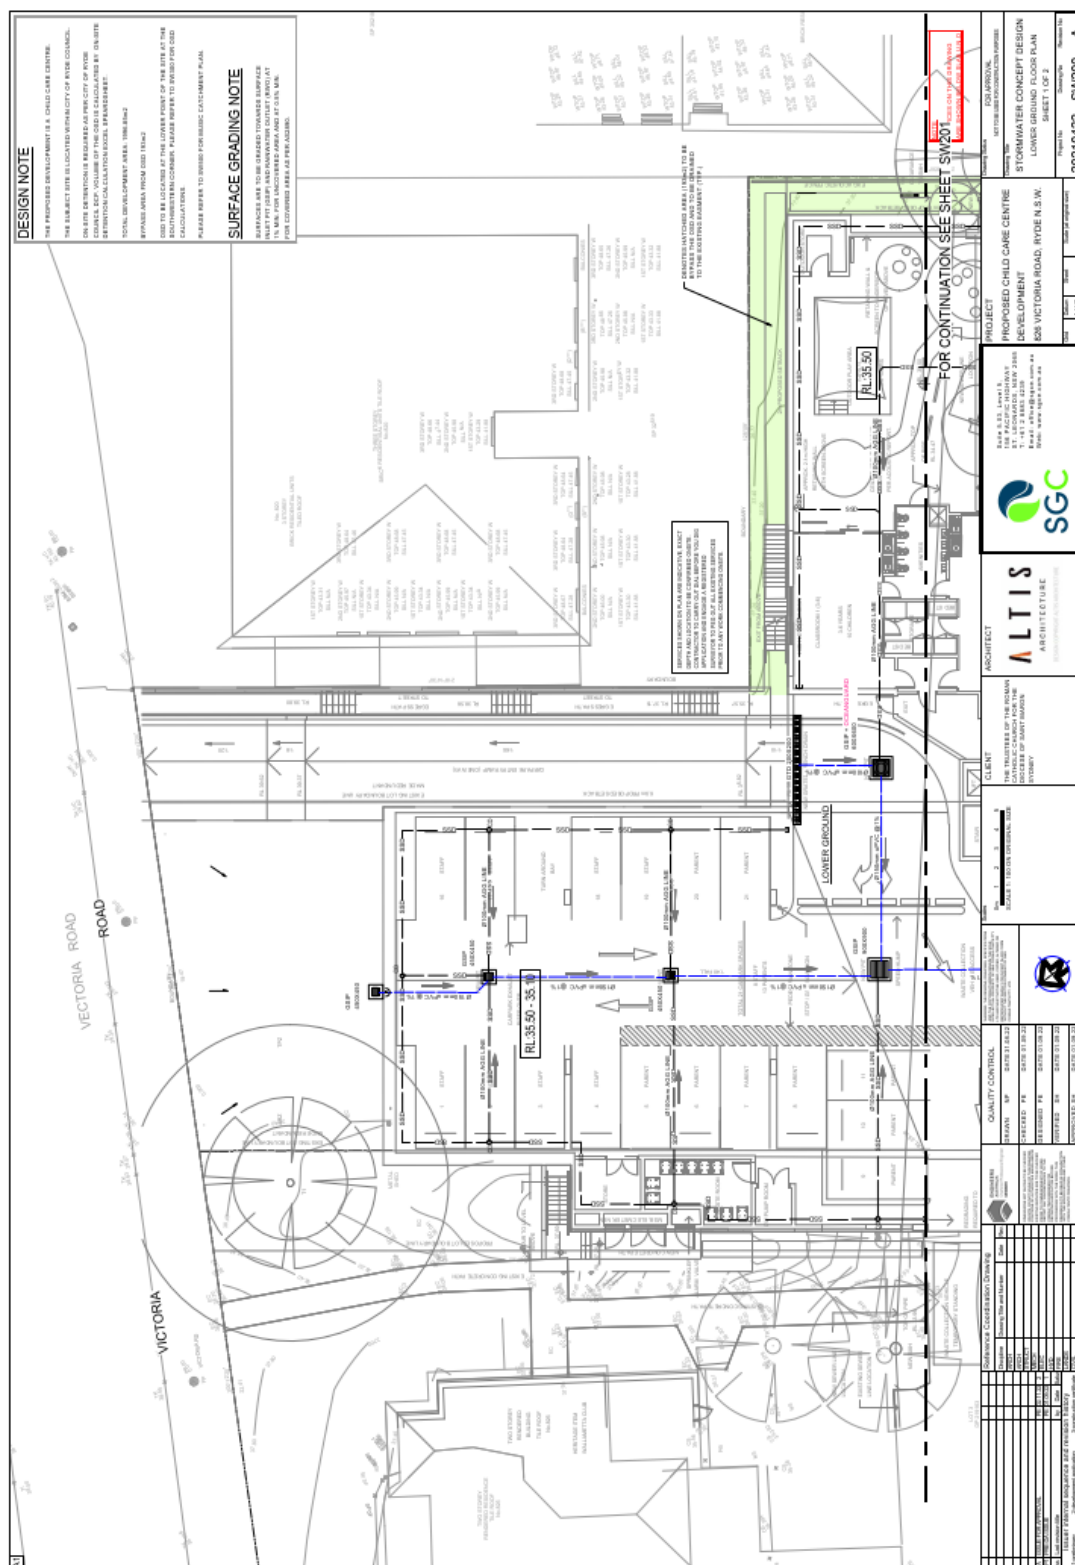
SW Concept Lower Ground Floor Plan 1 of 2
